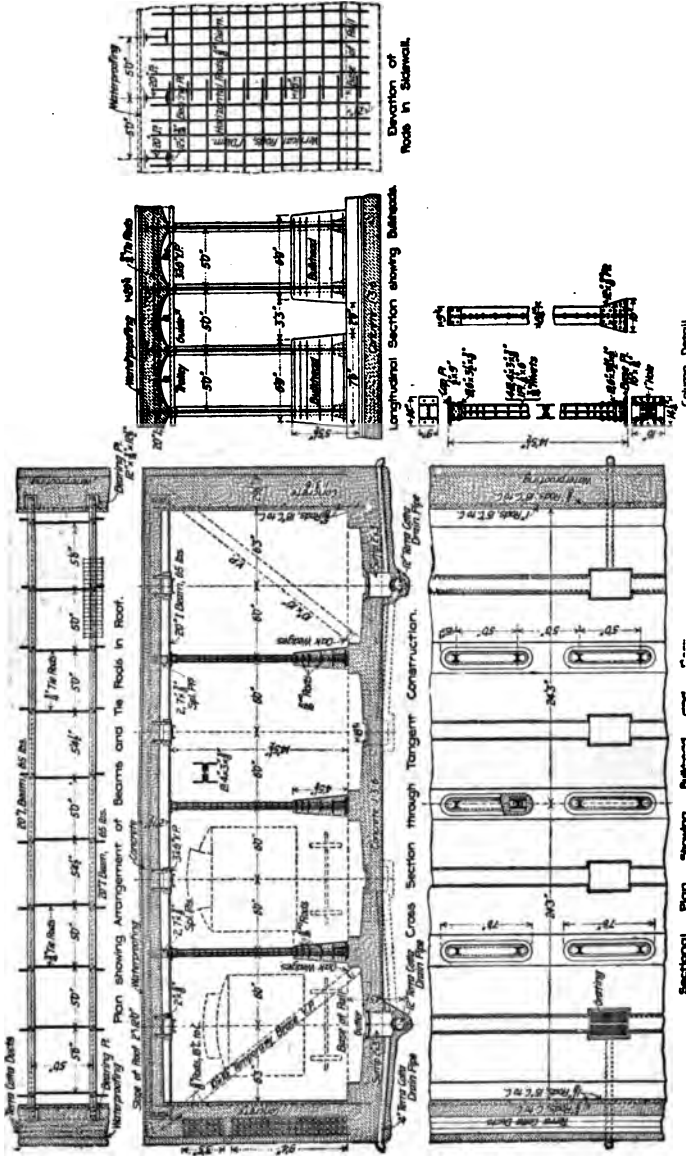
Details of Philadelphia Rapid Transit Railway Subway.
